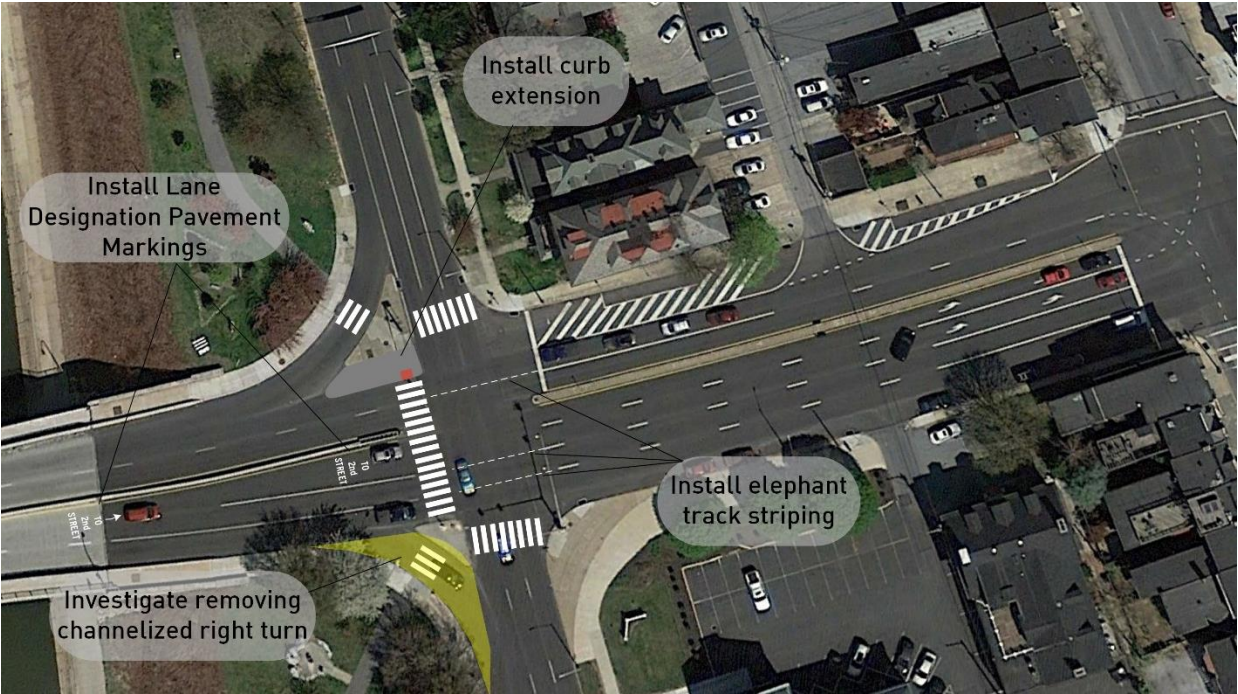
Proposed striping and pedestrian modifications, Front Street at Forster Street
